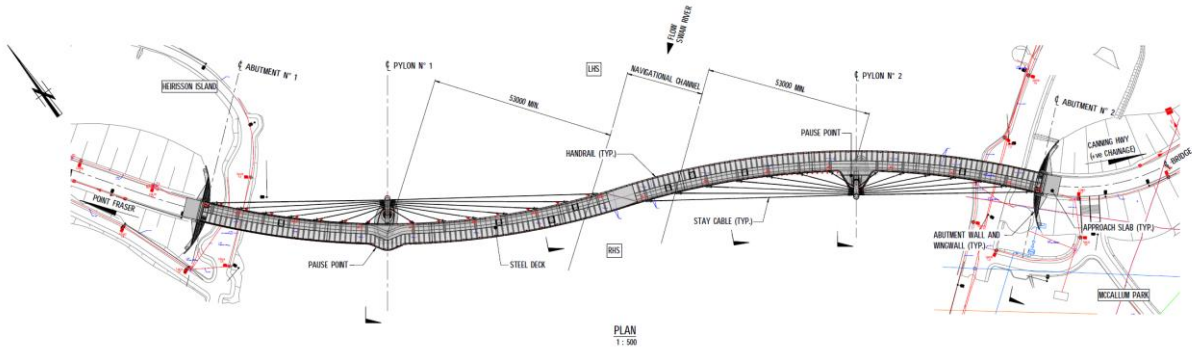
Plan view of McCallum Park Bridge, the pause points are visible at the pylons
